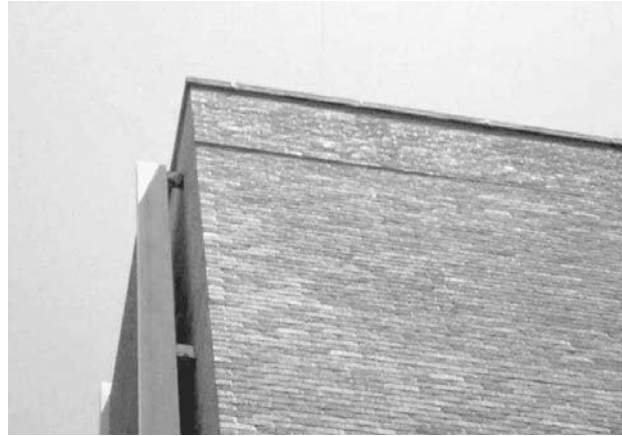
Opposing moisture expansion of brick and curing shrinkage of concrete slab can cause cracking at building corners if differential movement is not accommodated.
